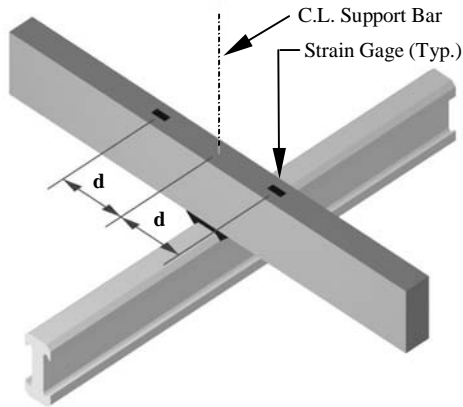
Typical Support-Bar Strain-Gage Layout (Bottom View)
